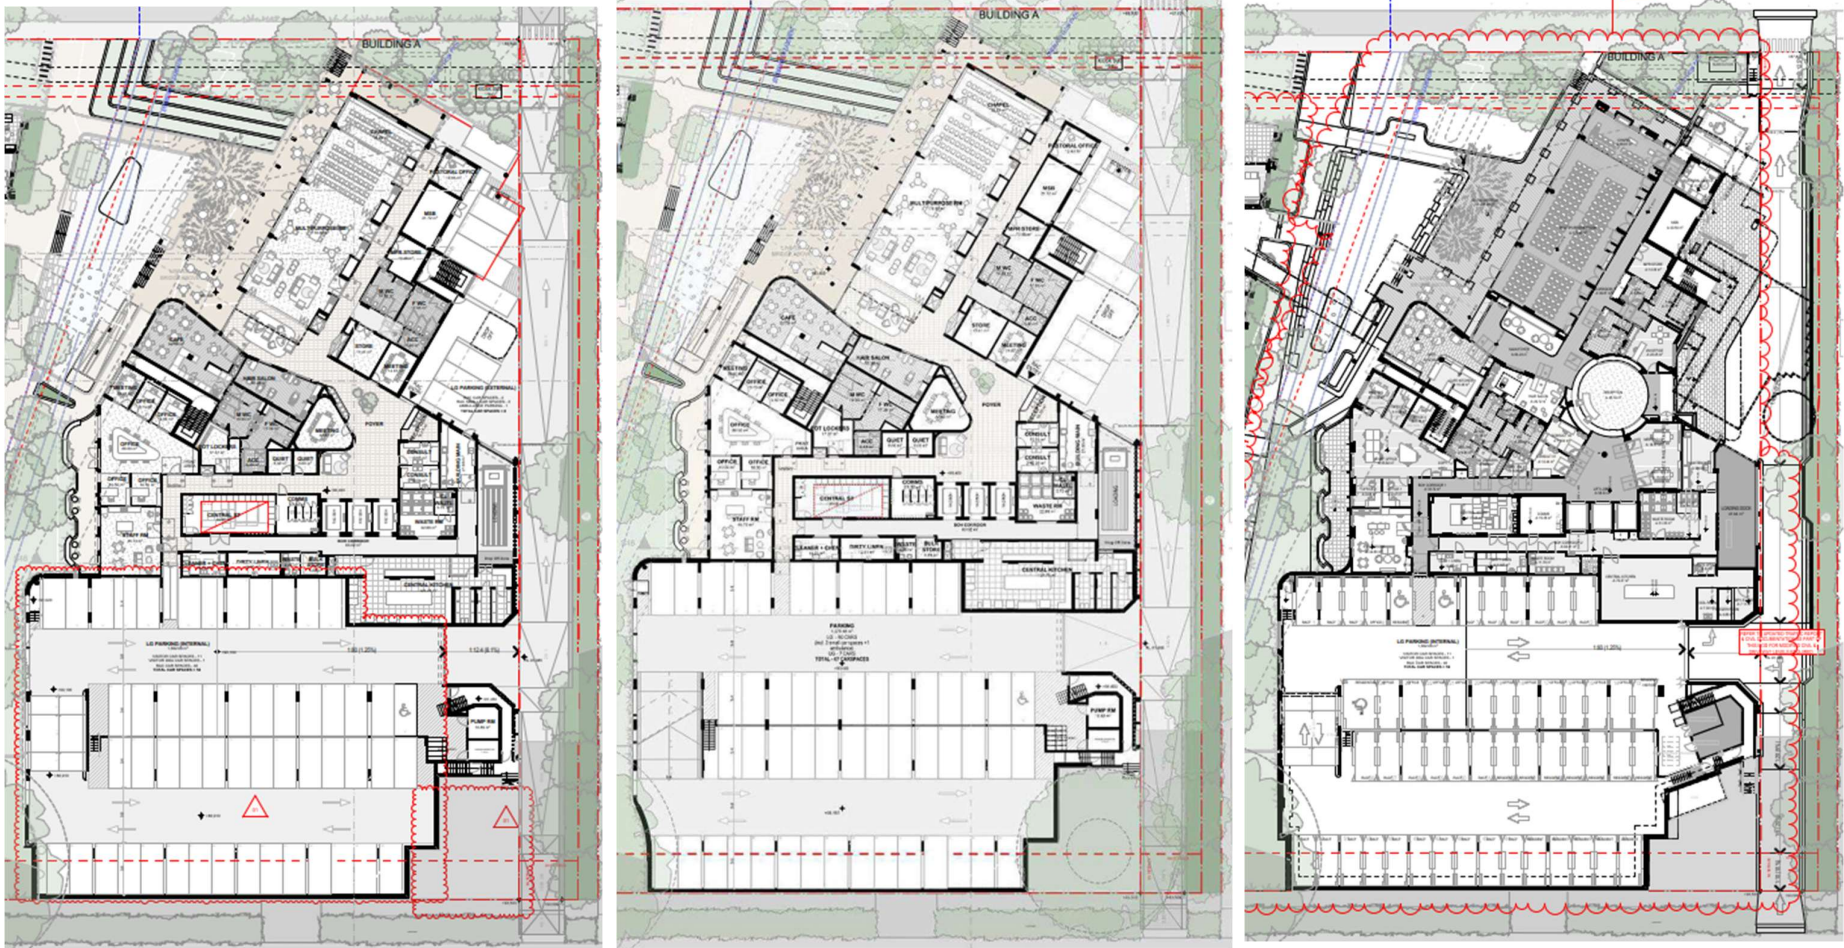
Originally Approved, DA MOD 1 and Proposed Lower Ground (LG) of Building A (2 of 2)
